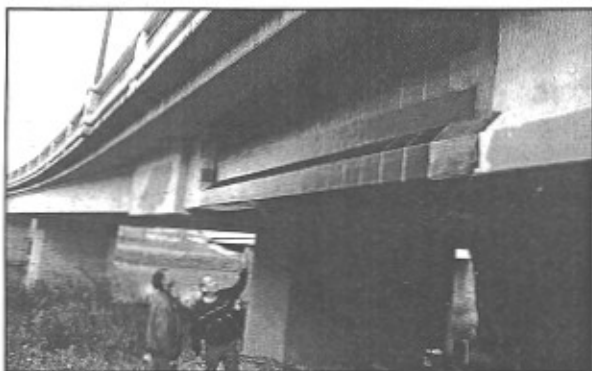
Strengthening of Maryland Bridge girders with CFRP sheets.
